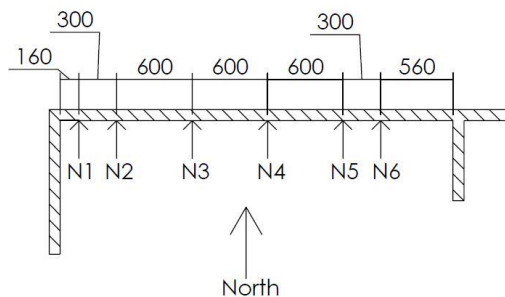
North Wall LVDT arrangement for the wall test with no brick veneer
